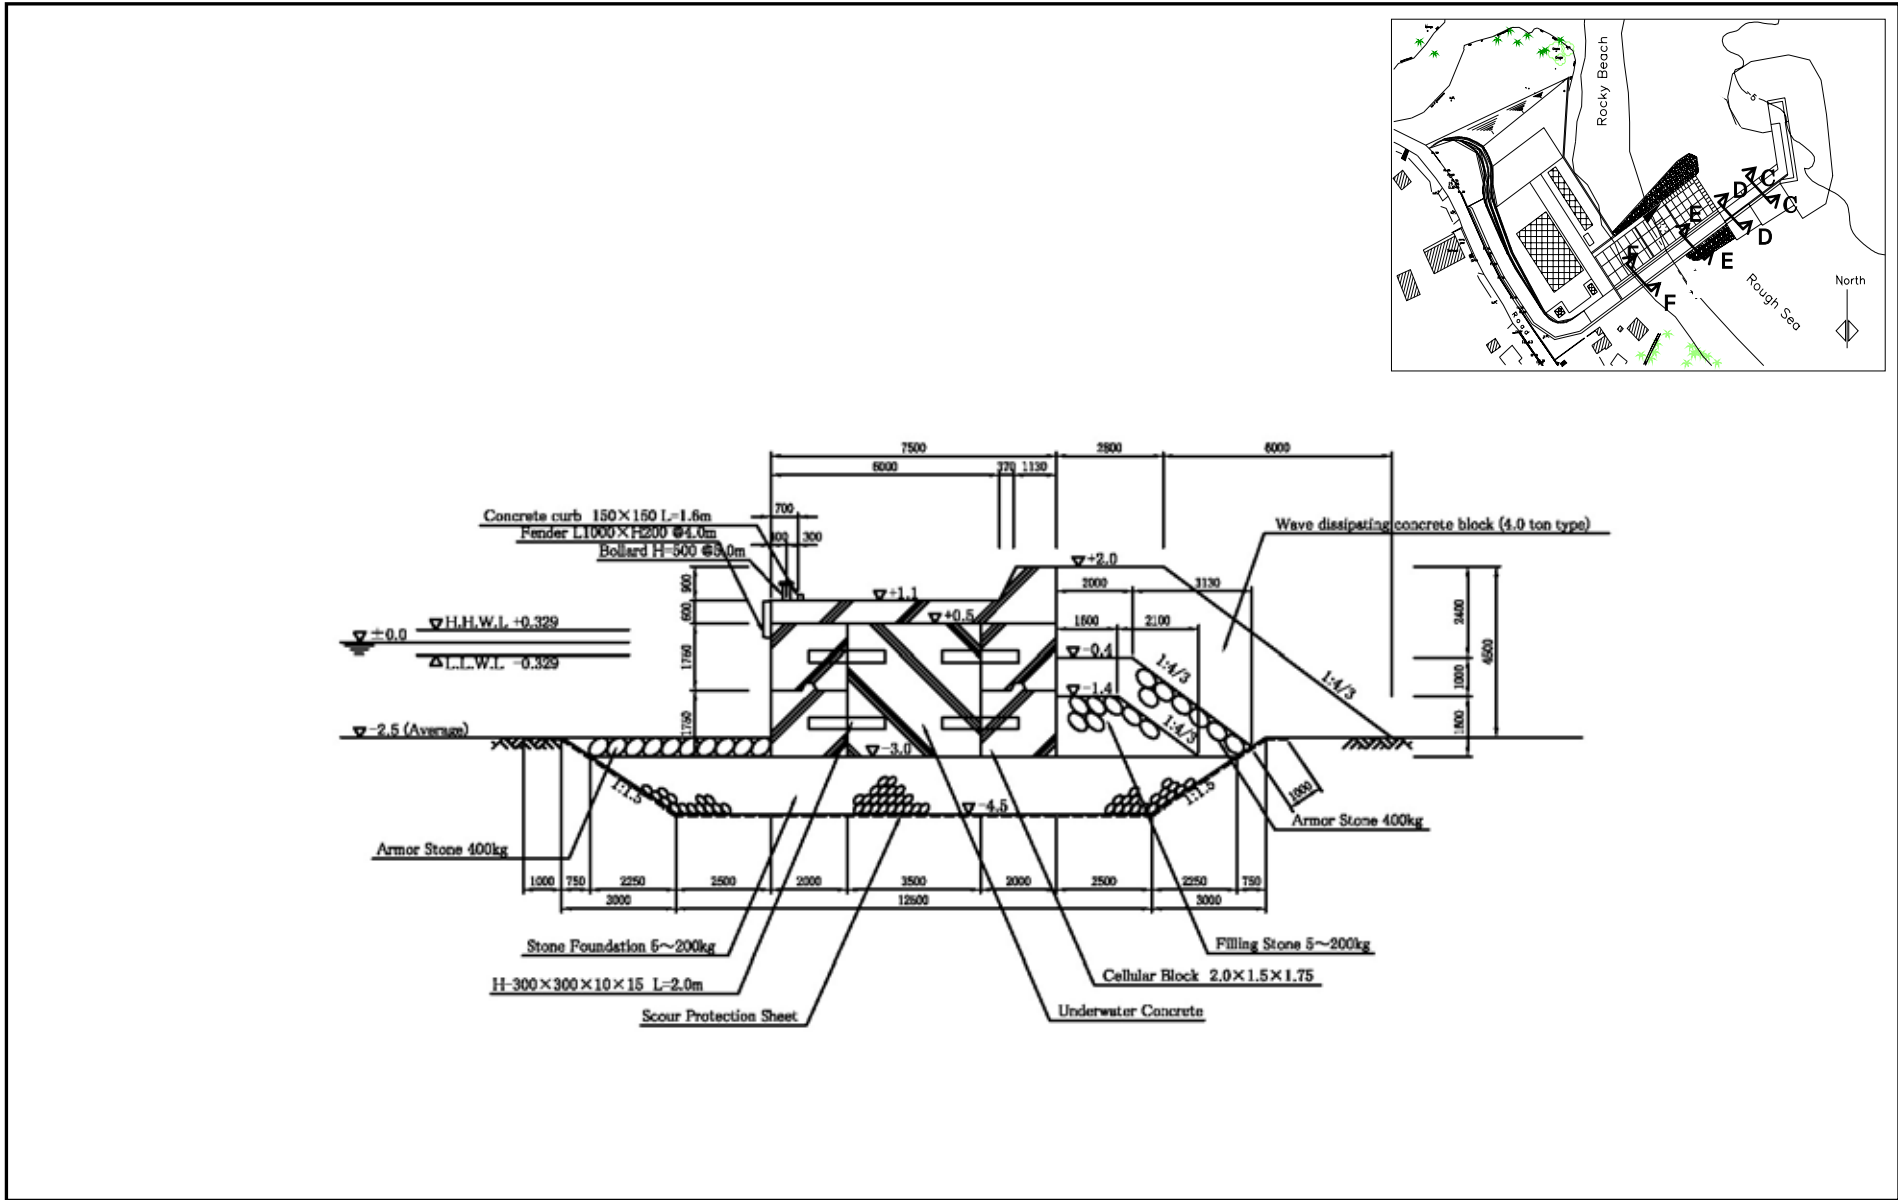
(5) Cross Section for Revetment (Section D-D)
